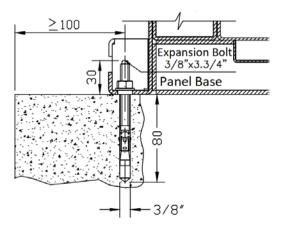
(a): Expansion bolt for anchoring of the SSW7000 panel to the floor – dimensions in mm [in]
